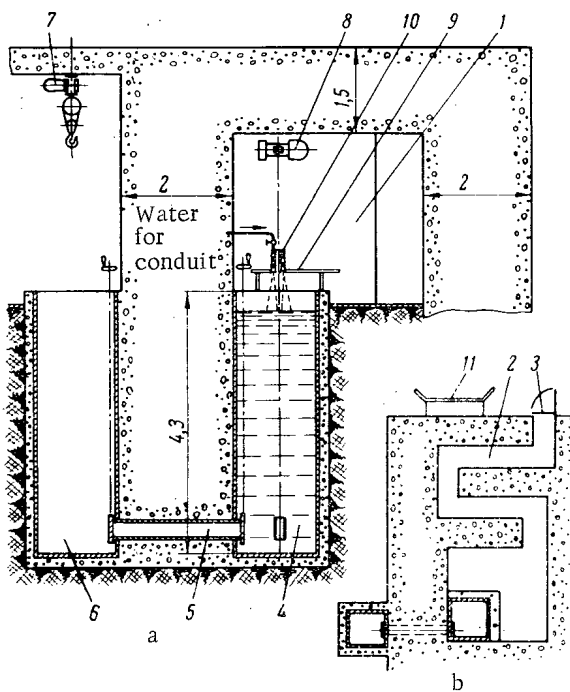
UK-70 000. a) Vertical cross section; b) plan.
